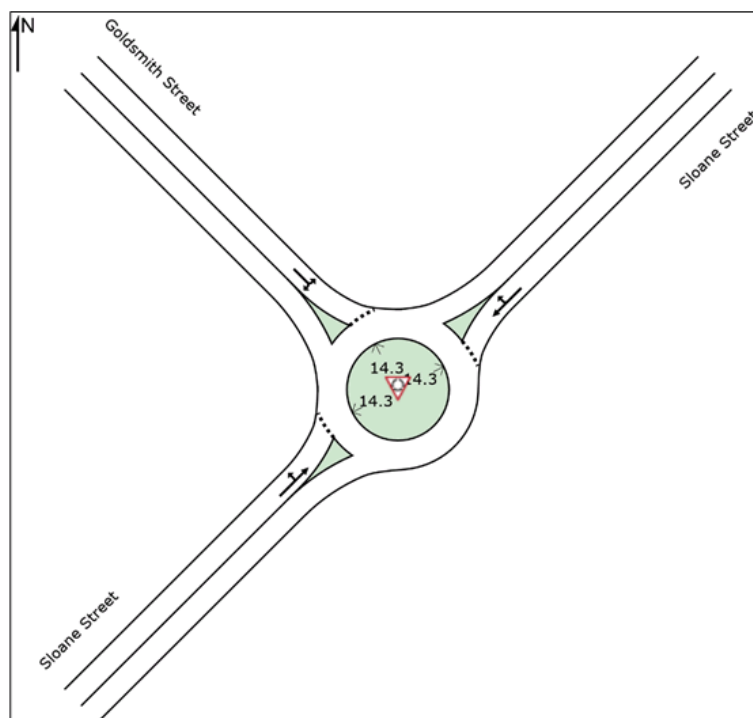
Roundabout intersection of Sloane Street with Goldsmith Street (SIDRA)
